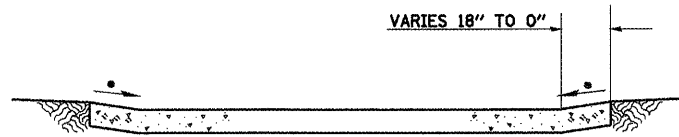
DETAIL C - URBAN PE & CE (NO CURB & GUTTER)
